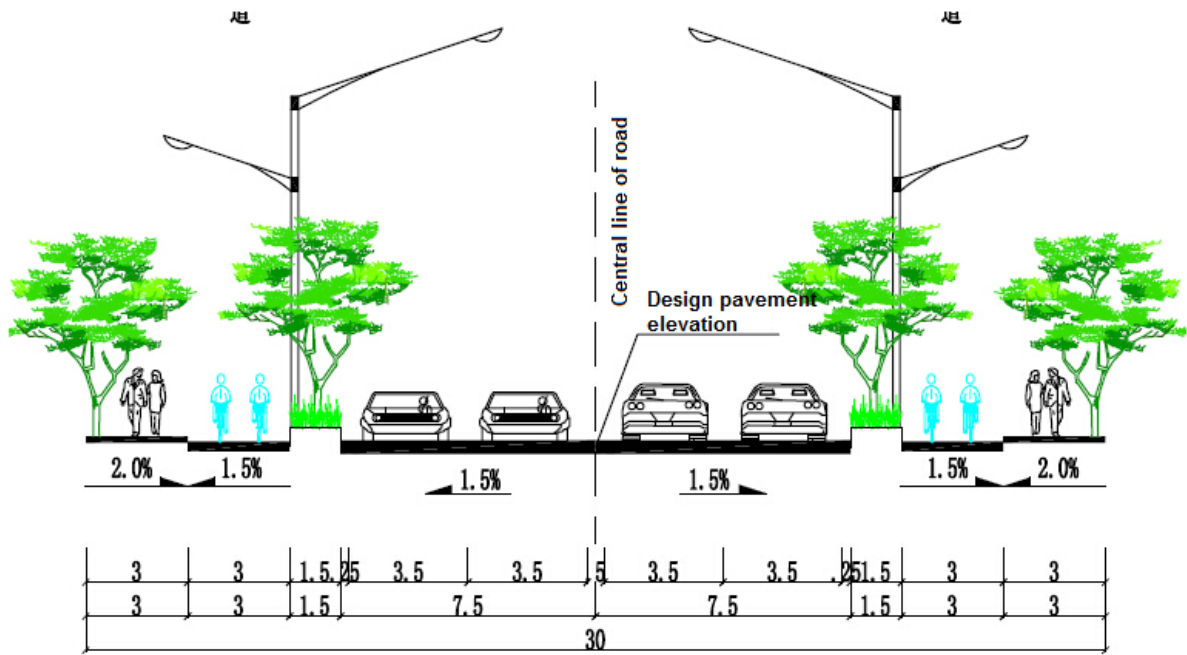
Cross-sectional Diagram of Urban Branch Road
